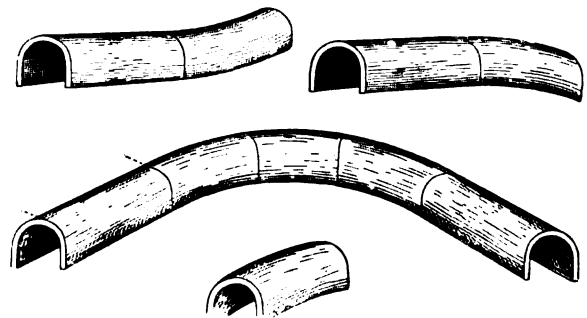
CURVED PIECES OF SEWALL CONDUIT DUCTS.
